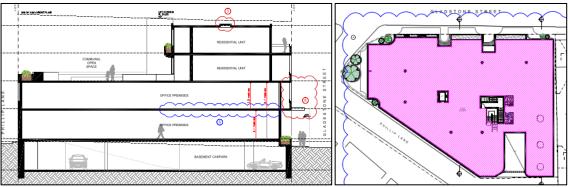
Revised plans – cross section and mezzanine/level 1 (GFA highlighted in pink)
